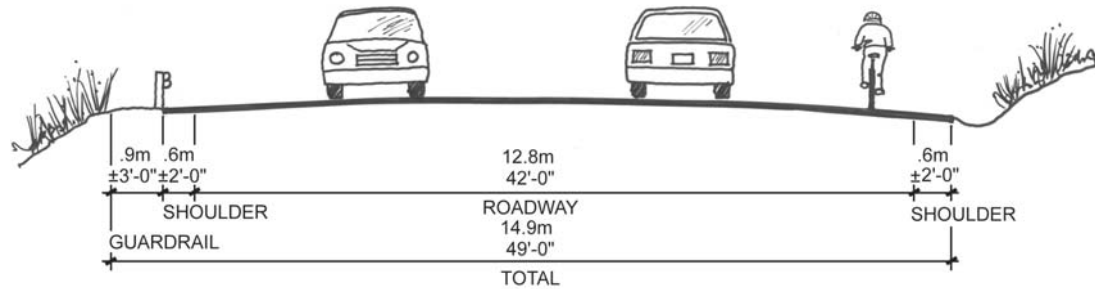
Existing Conditions at Lincoln Boulevard at Pershing Drive North
